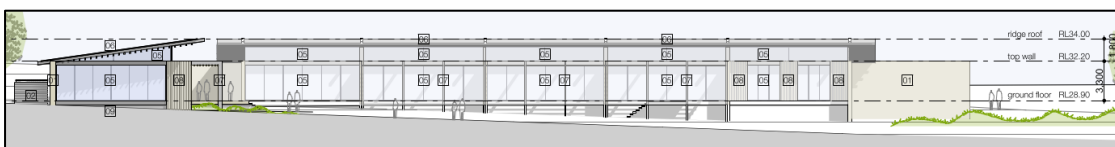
Northern elevation of the chocolaterie building. Source: Application documents.
